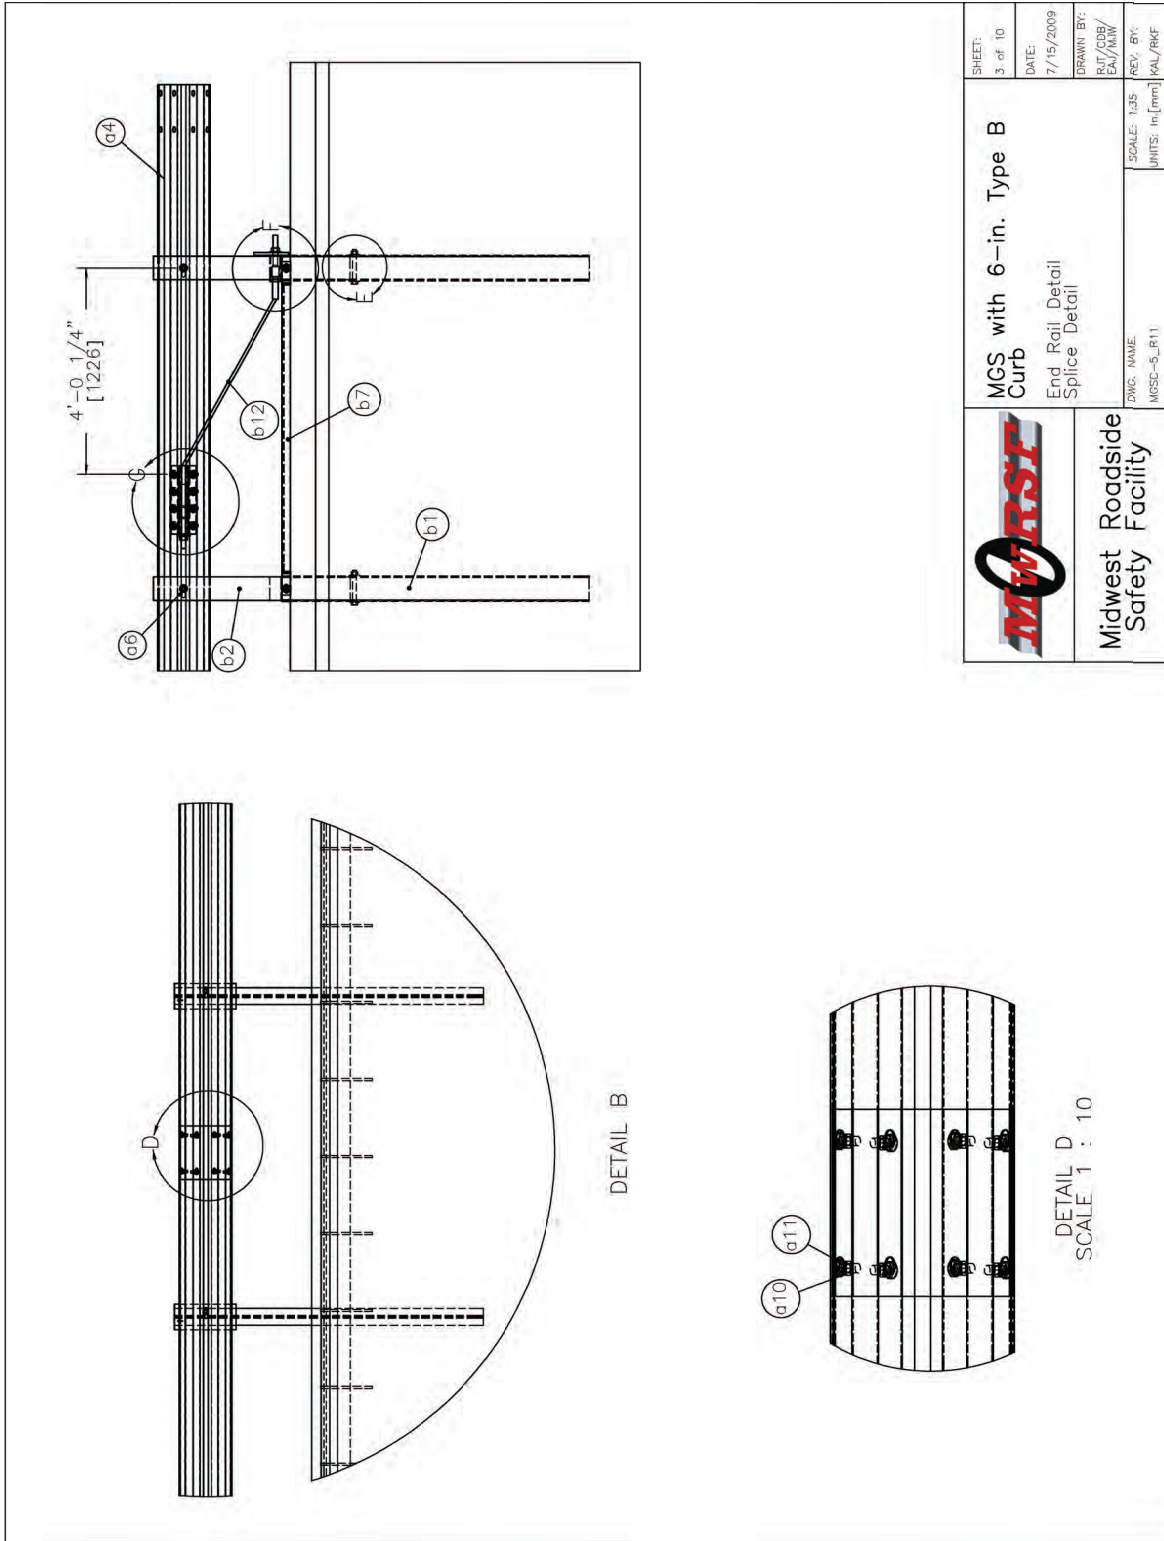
End Rail and Splice Details, Test No. MGSC-5
